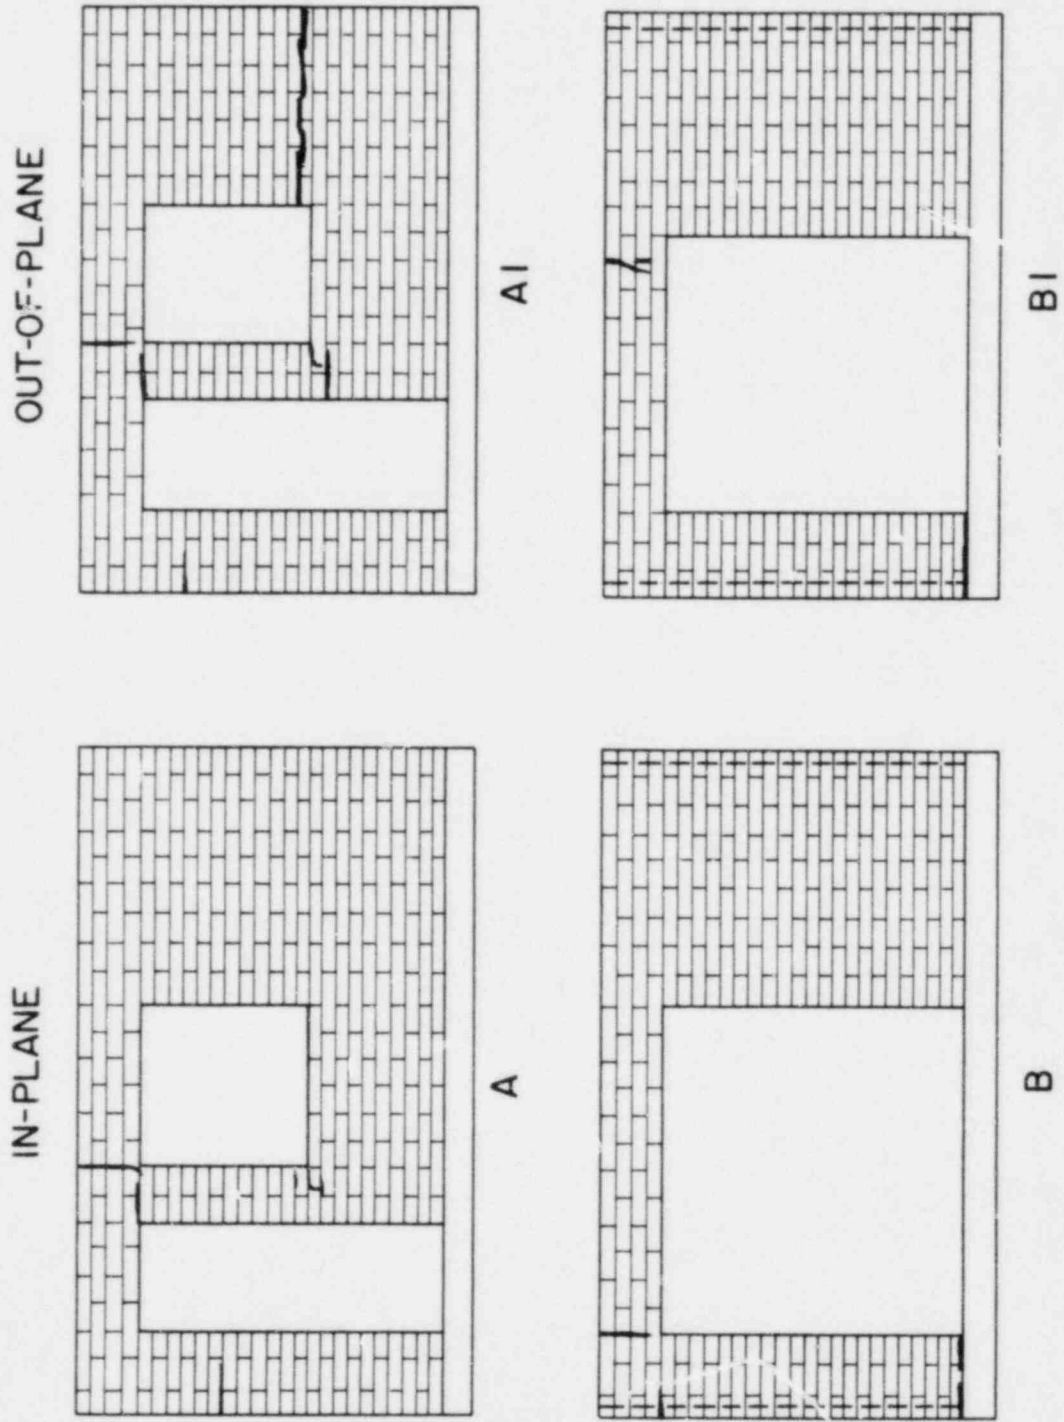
(b) DISTRIBUTION OF CRACKS IN THE MASONRY COMPONENTS: HOUSE 2, AFTER TEST 14
